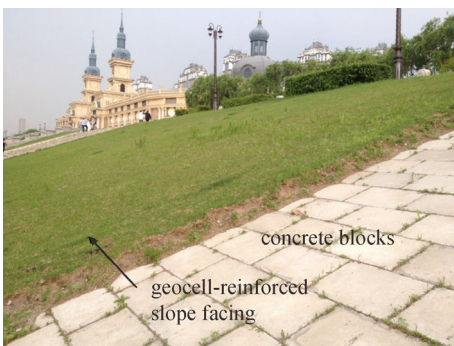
Geocell-stabilized slope facing vs. concrete blocks (photo taken by J. Han)
